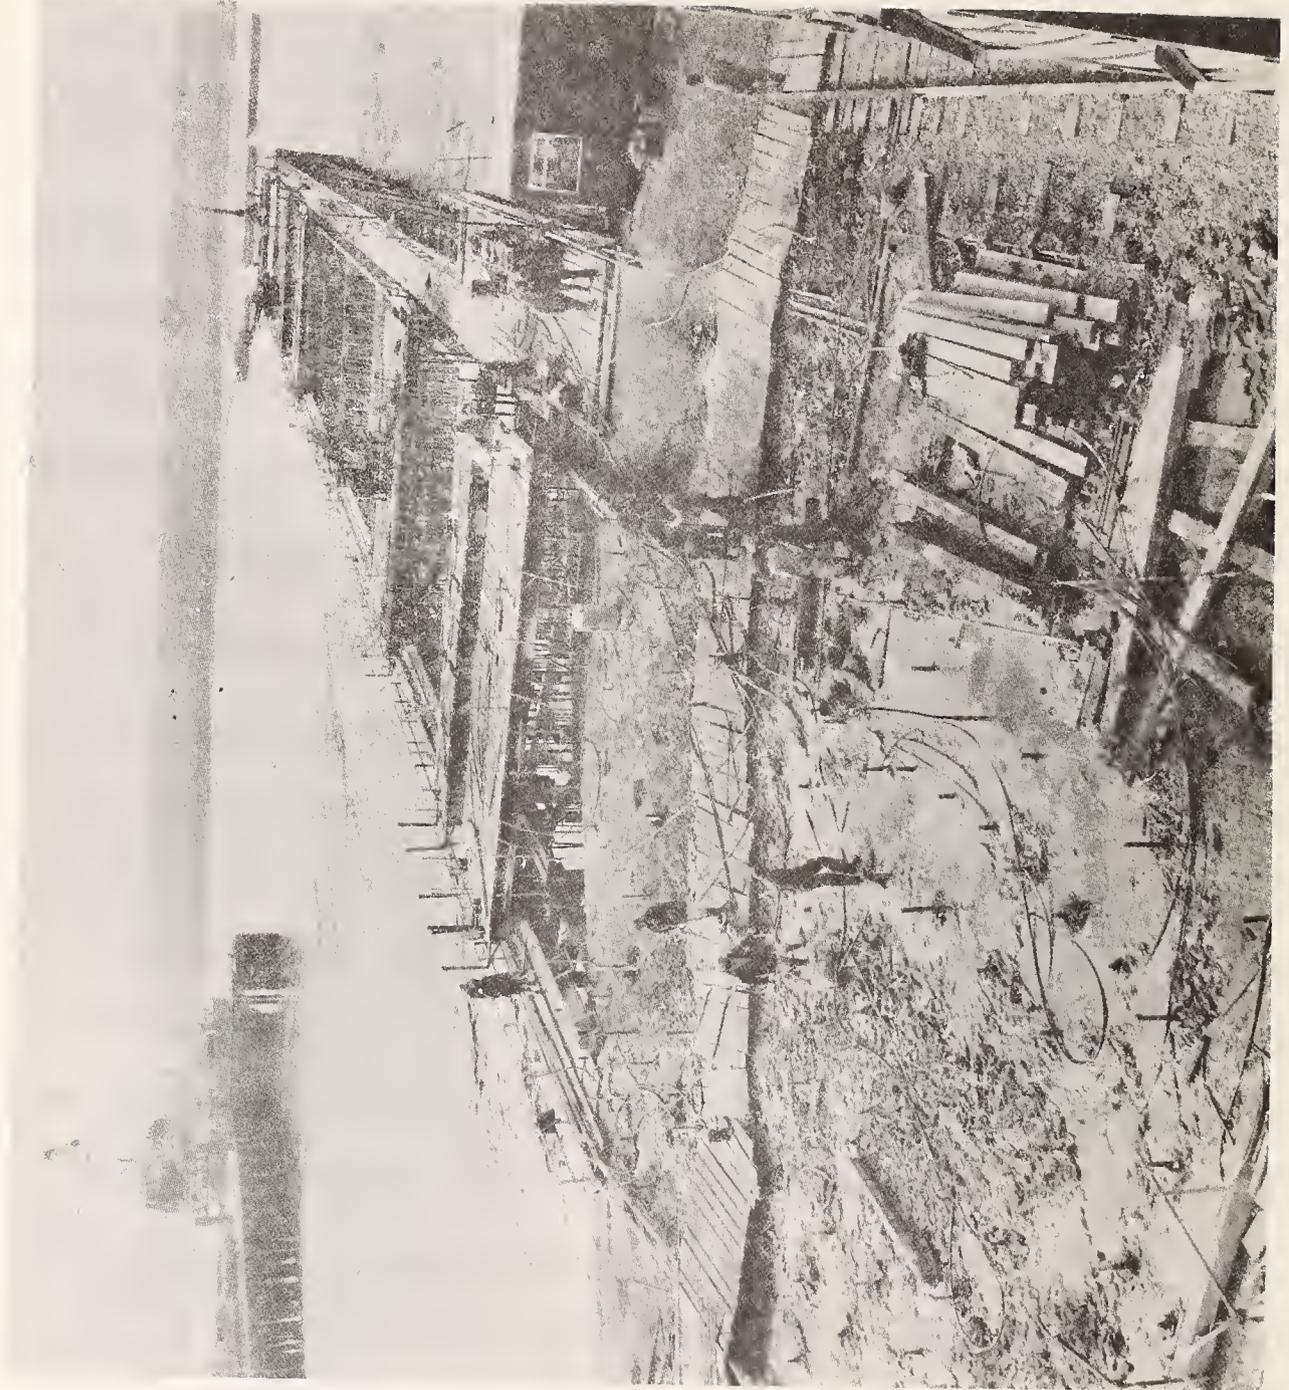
GROUTING FROM SPECIAL JETTY BUILT INTO THAMES RIVER ABOVE SECOND DARTFORD TUNNEL
